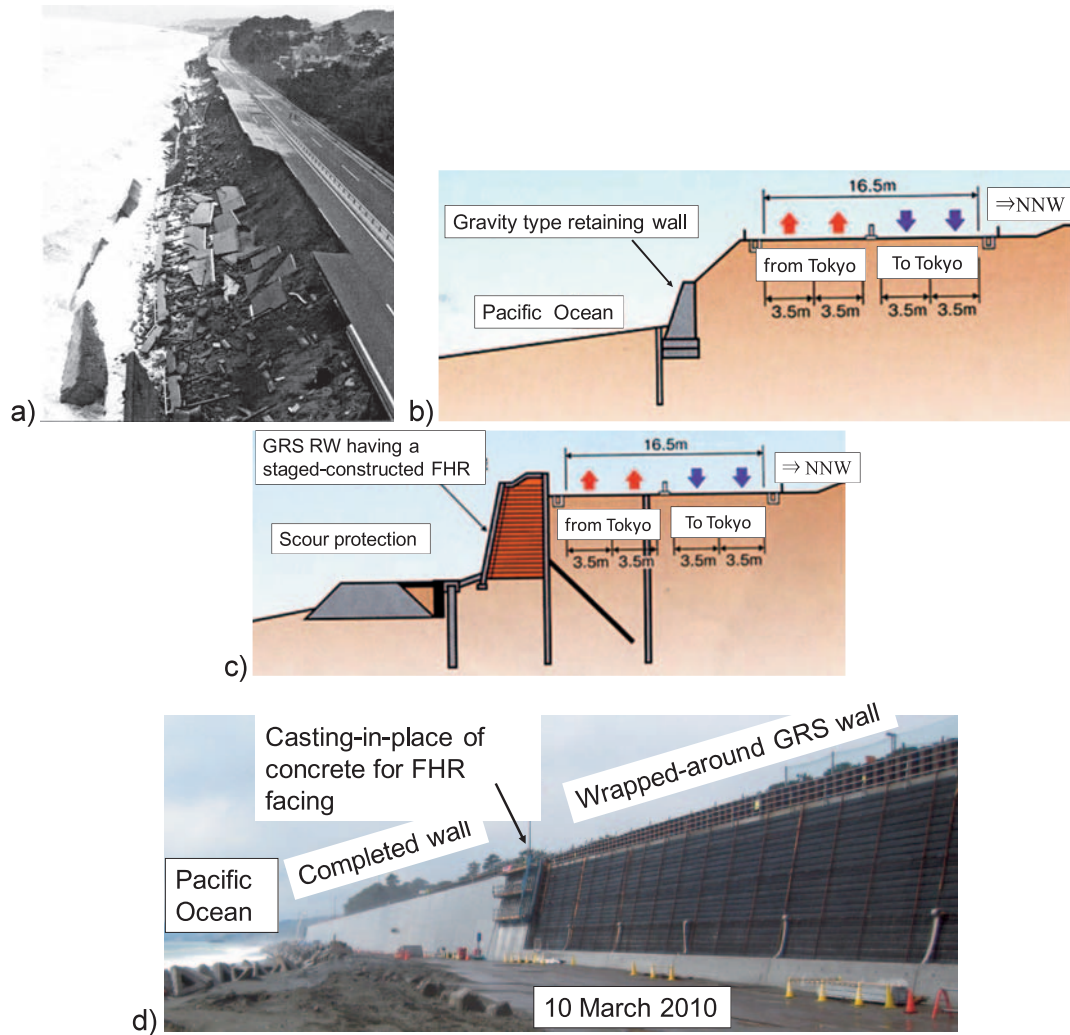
Seawall of Seisho by-pass for National Road No. 1 in Kanagawa Prefecture, southwest of Tokyo: a) collapse for a length of about 1 km by Typhoon No. 9, 29th Aug. 2007; b) original structure; c) reconstructed seawall; and d) the wall during construction (a), b) & c): by the courtesy of the Ministry of Land, Infrastructure, Transport and Tourism; and d) by Tatsuoka, F.)
